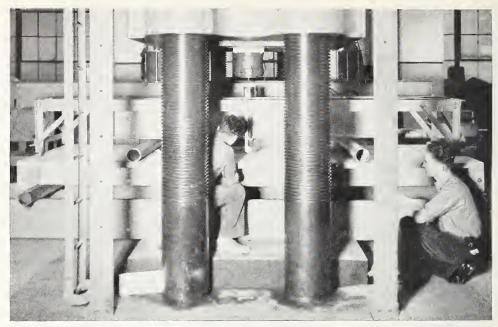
Floor specimen CY-T1 under transverse load.
